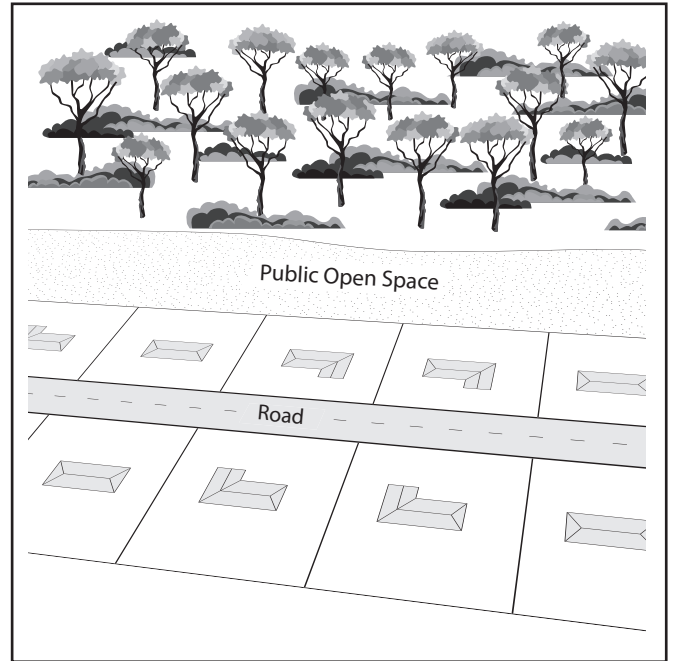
Public open space provides separation for the subdivision from bushfire risk.
